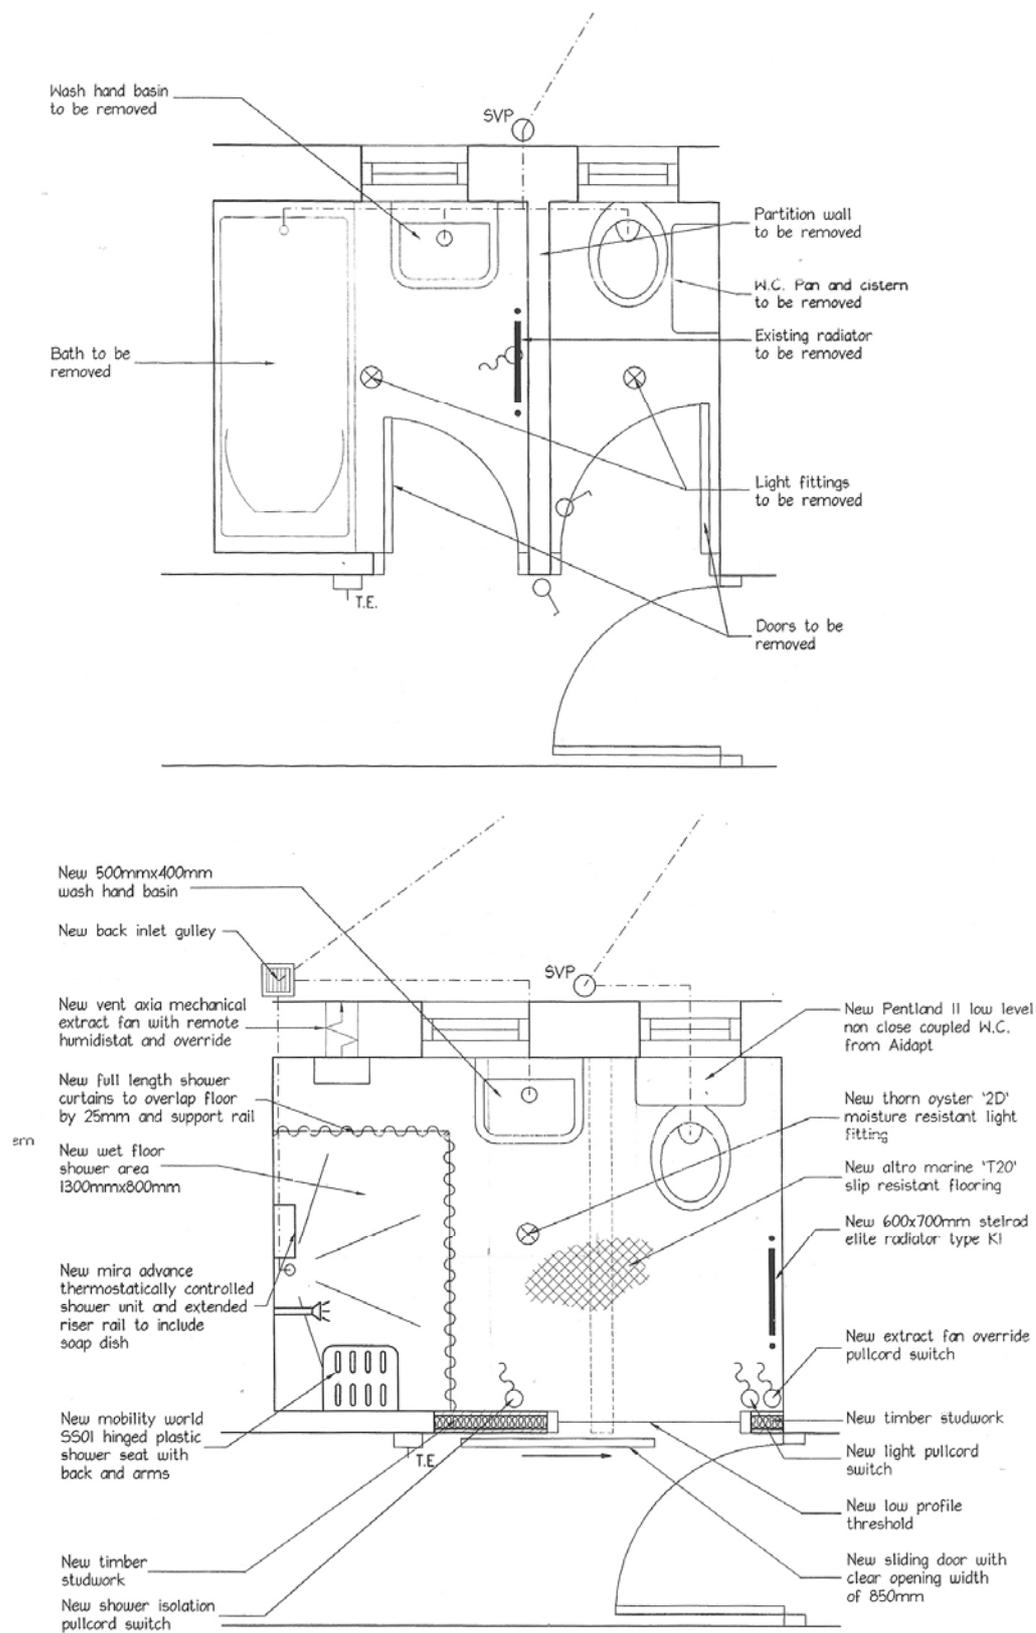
Builder's working drawings. Existing (on top) and proposed layout.
